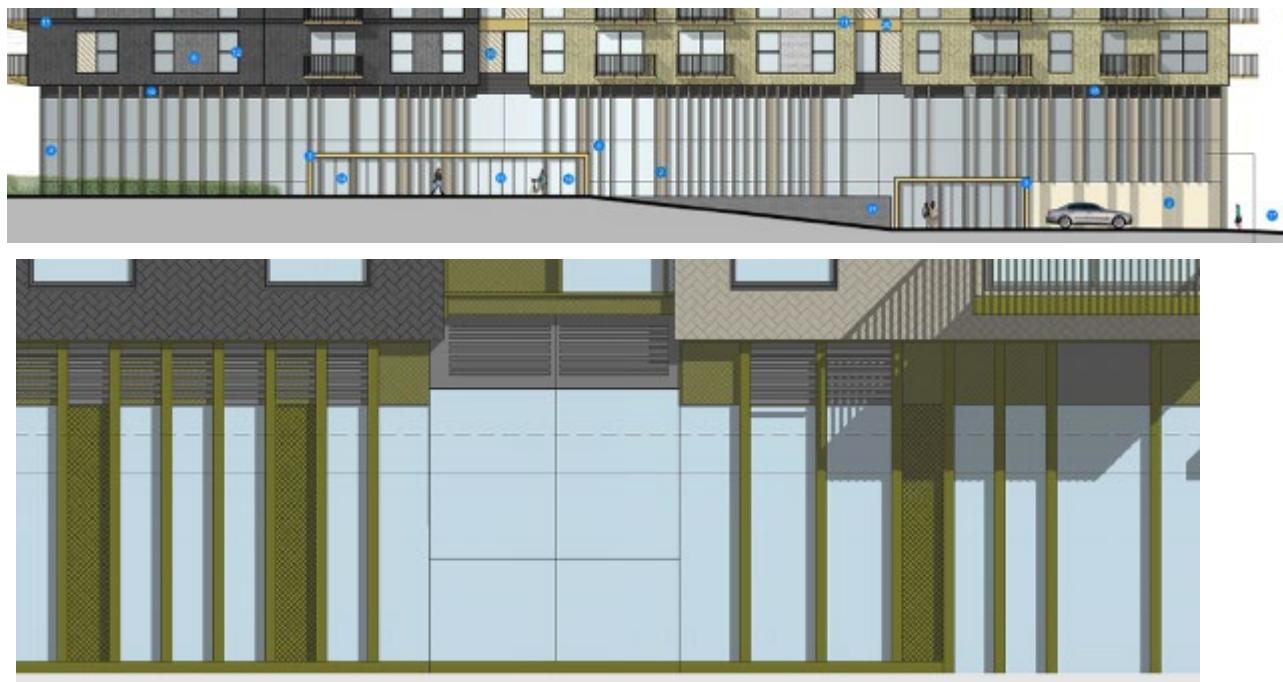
Architectural Detailing at Street Level (Beaver Road Frontage)
